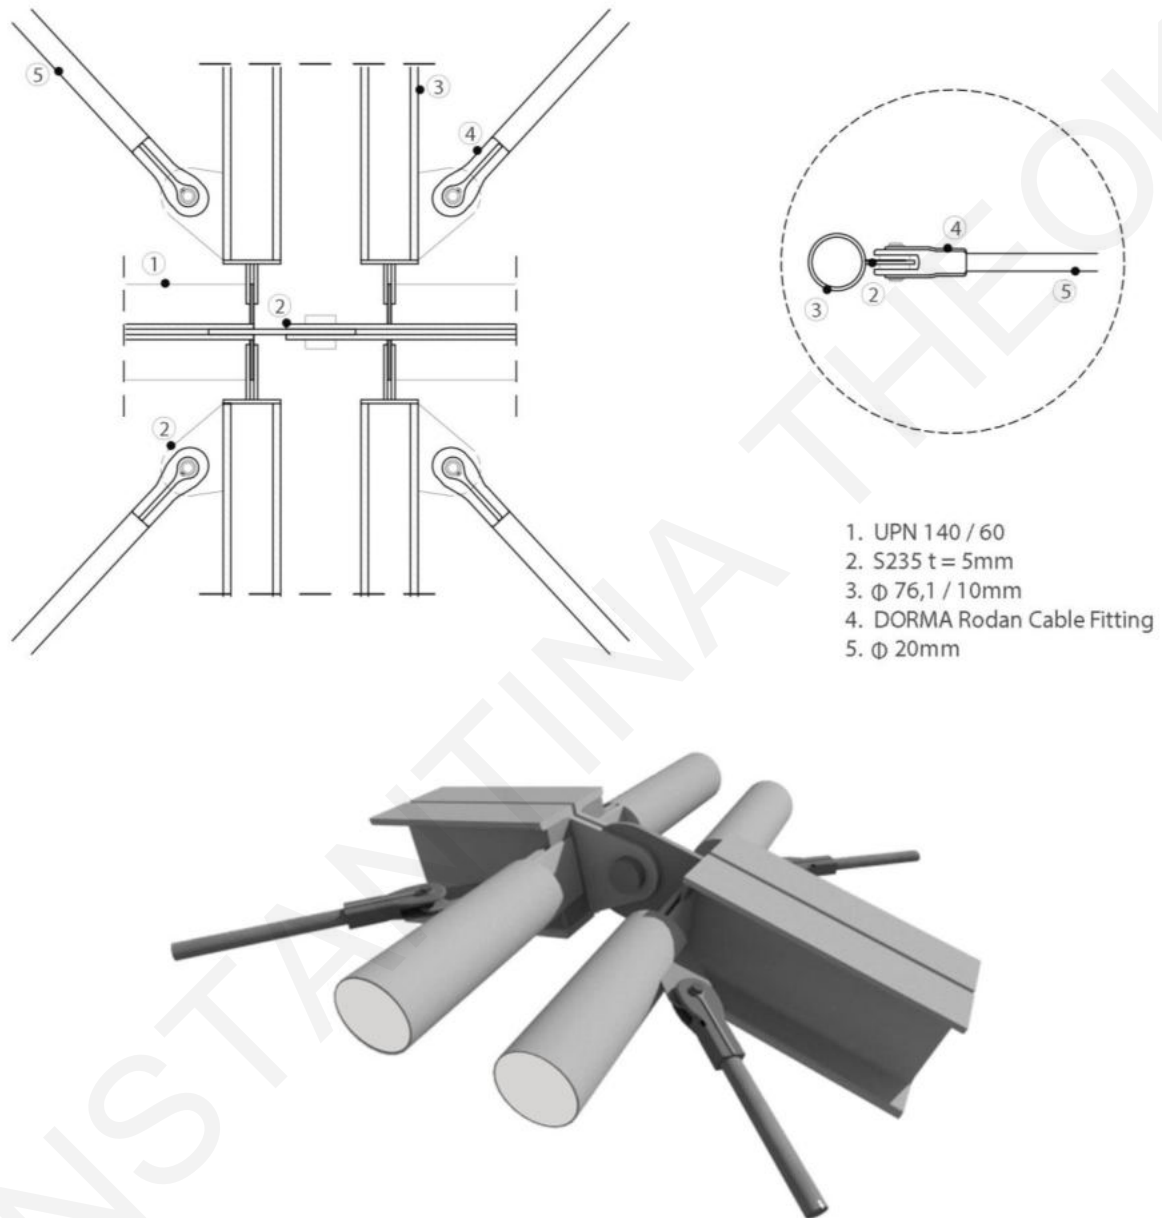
Construction design principle of secondary structure to the planar linkages of the spatial system, Scale 1:10
